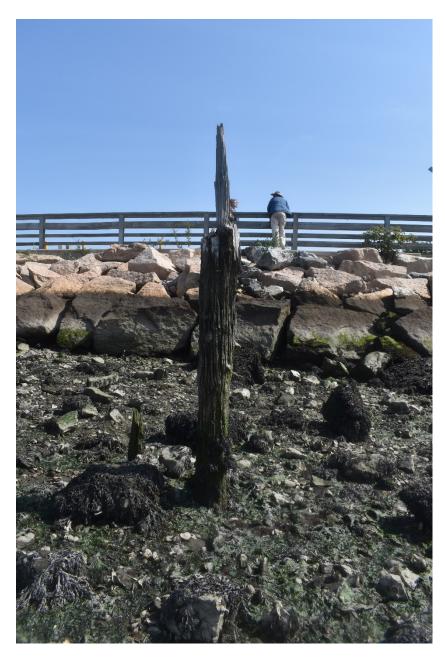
Long Wharf Pier, looking southeast from head of the pier.
